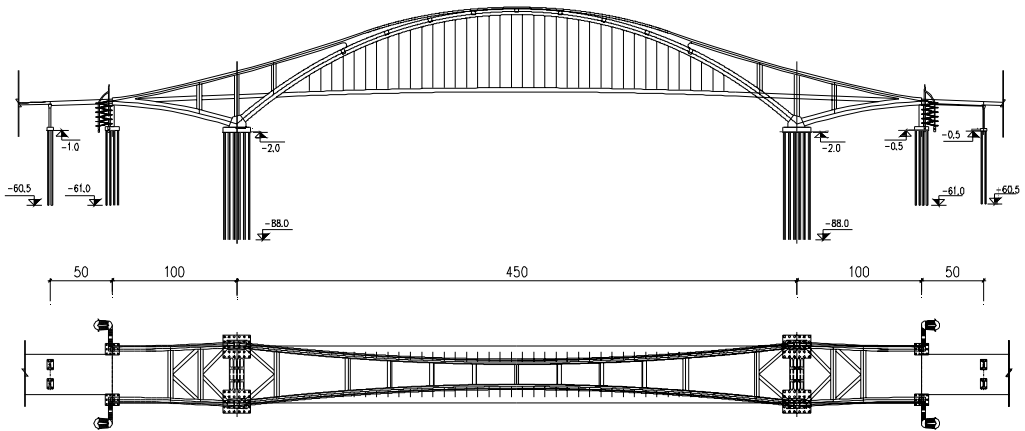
Plan and elevation of Mingzhou Bridge (dimension in meter).
